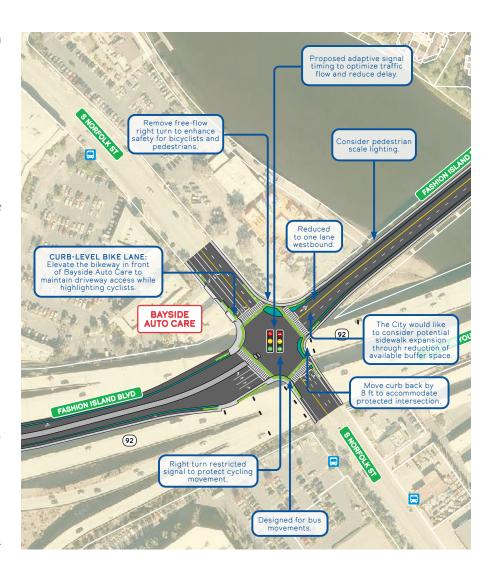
H NORFOLK STREET INTERSECTION CONCEPT PLAN
